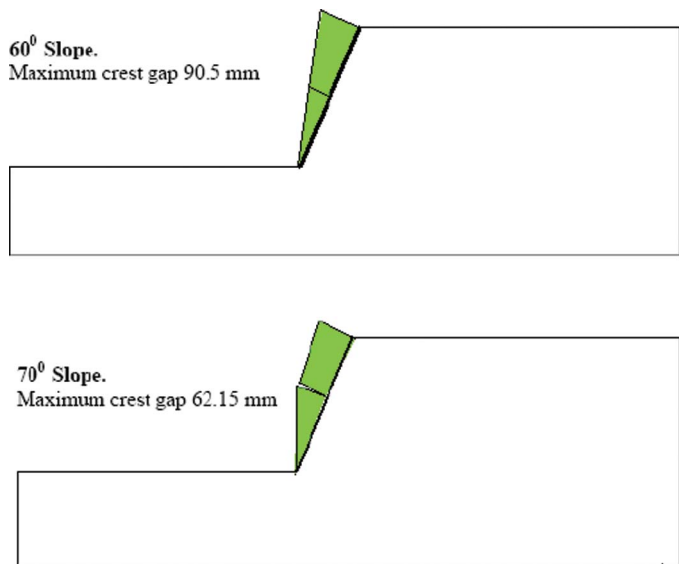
Developed gap between the backfill and facing wall as obtained in the numerical analysis.
